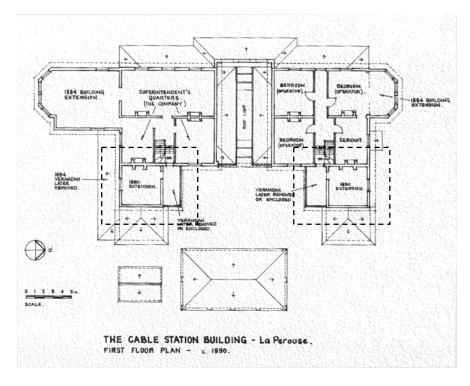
First floor plan of Cable Station building following further additions in 1890 (from Danis et al. : 166).
